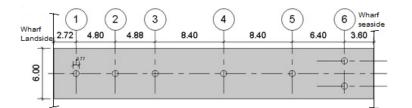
Plant view of a typical wharf strip 6 m long. Axis 6 contains two piles spaced at 3 m.
